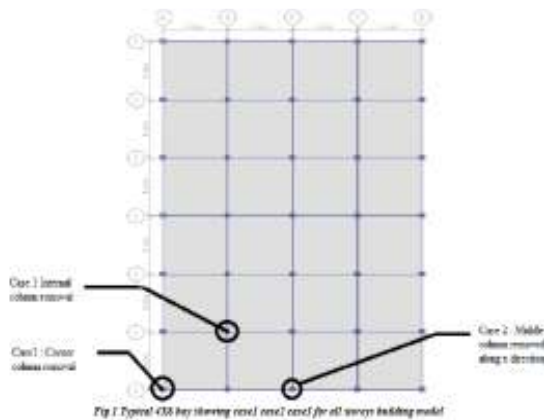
Typical 4X6 bay showing cas1, 2, 3 for all storeys building model
